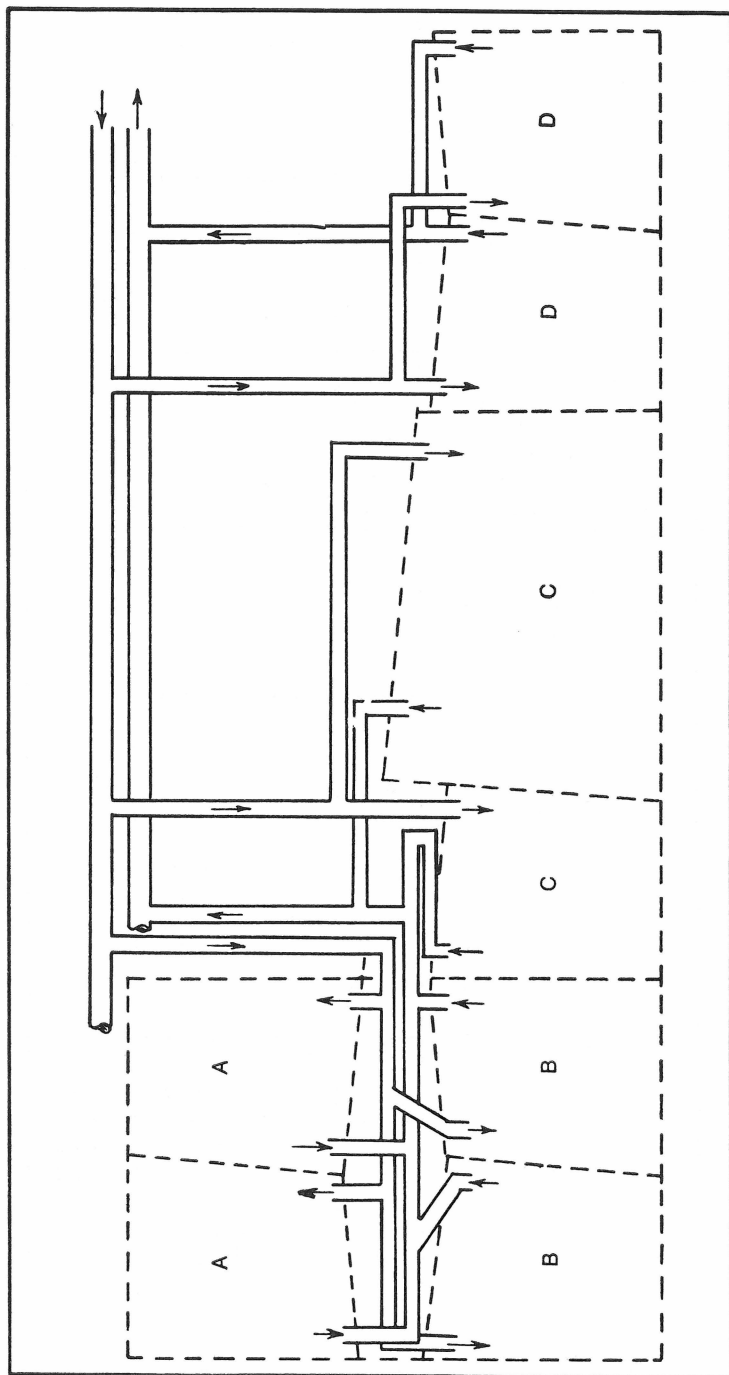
Air handling ducting plan for the studio complex. This plan places a maximum length of ducting between grilles of adjacent rooms to prevent crosstalk from room to room via the duct. Lined ducts attenuate sound conducted along the ducts.
